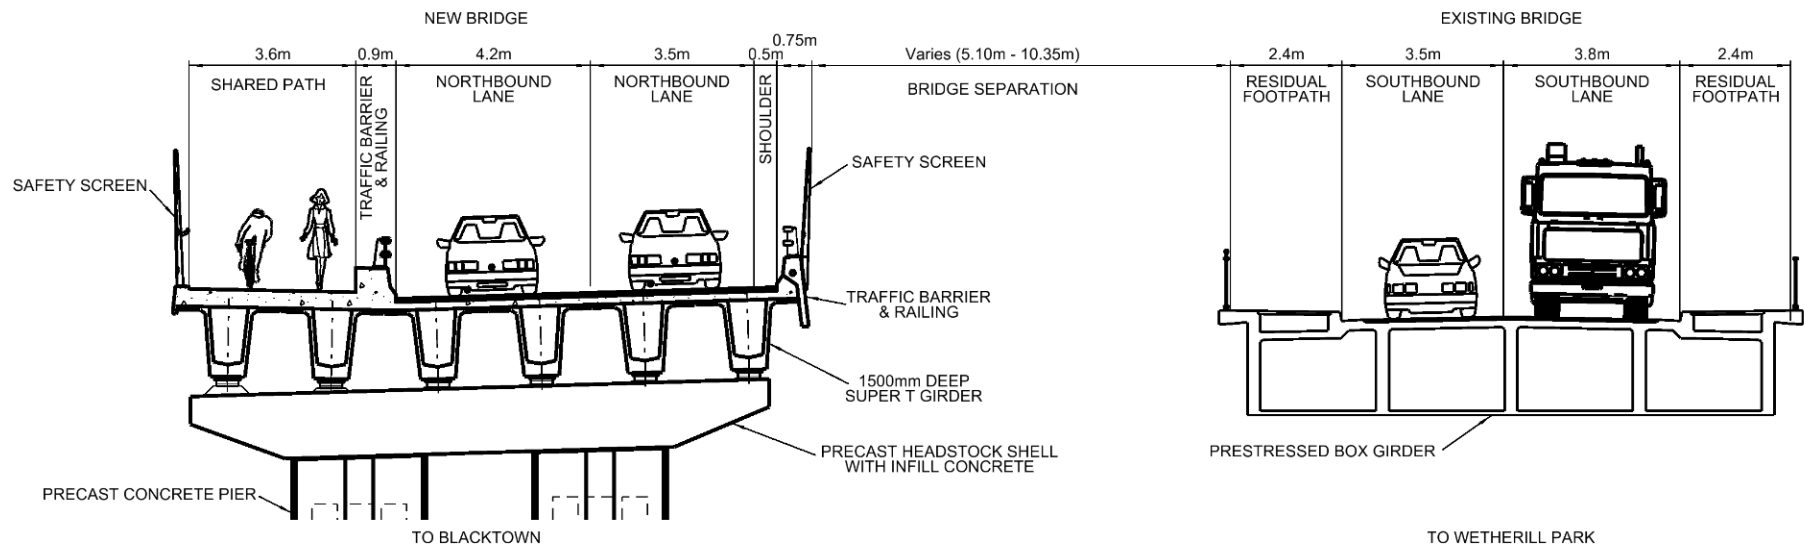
Typical bridge cross section – Great Western Highway bridge
